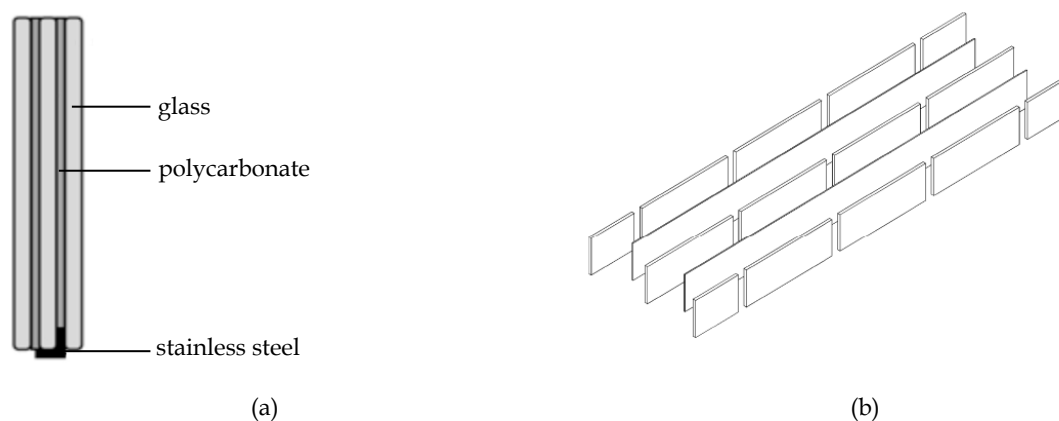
Reinforced segmented glass beam investigated by Veer et al. Schematic cross section (a) and segmentation scheme (b).
